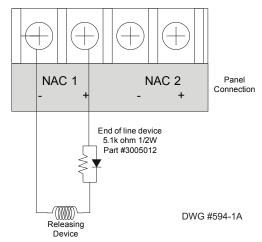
NAC Releasing Circuit Wiring with EOLD Assembly
